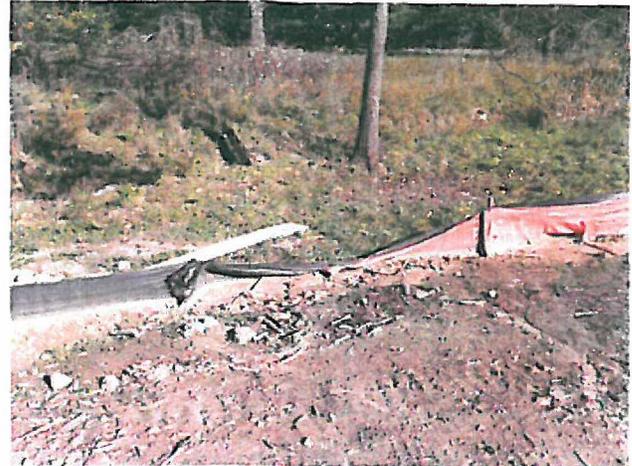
(RIGHT). A board was placed over top of this silt fence on S/L 14, pushing it down. Silt fence must be kept erect to allow runoff to pond behind it and seep slowly through the geotextile.
